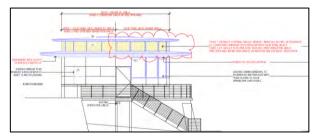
Proposed modifications to north (promenade) elevation of Lifeguard Tower, Tunnel 2 and Amenities block.
